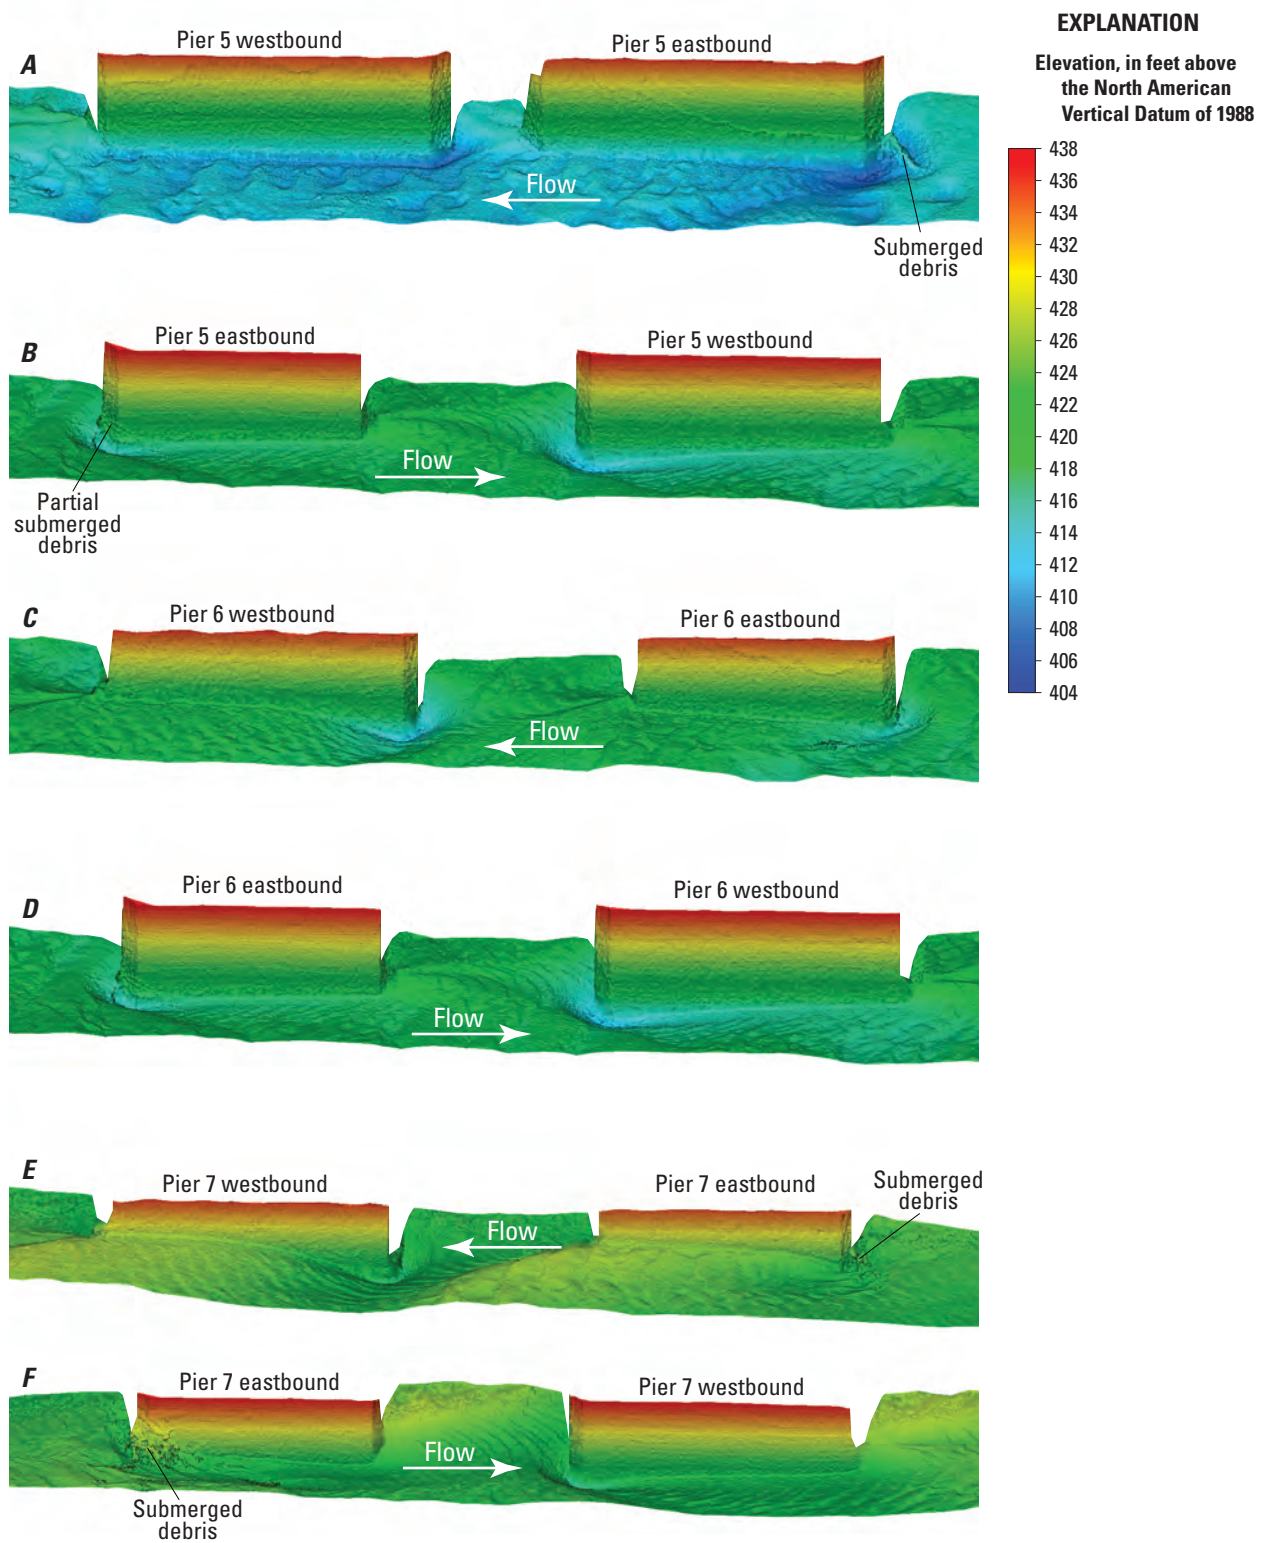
Shaded triangulated irregular network visualization of the channel bed and piers of dual bridge structure A5585 on State Highway 364 over the Missouri River near St. Louis, Missouri. *A*, left (north) side of pier 5. *B*, right (south) side of pier 5. *C*, left (north) side of pier 6. *D*, right (south) side of pier 6. *E*, left (north) side of pier 7. *F*, right (south) side of pier 7.
